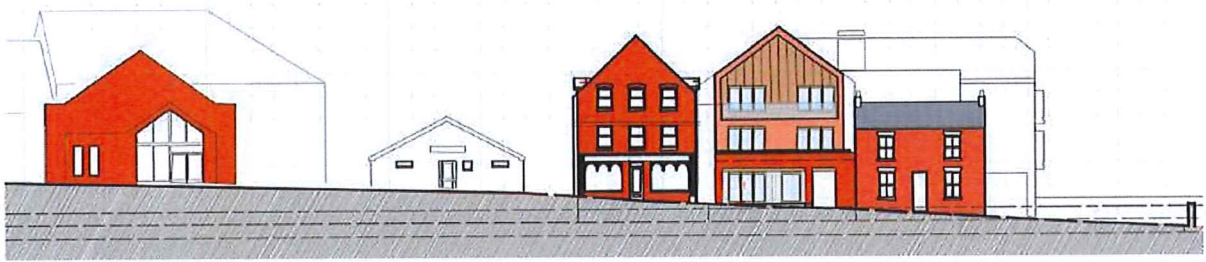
New Elevation inserted between listed New Market House & Gavel House takes its geometry from existing street elevations
